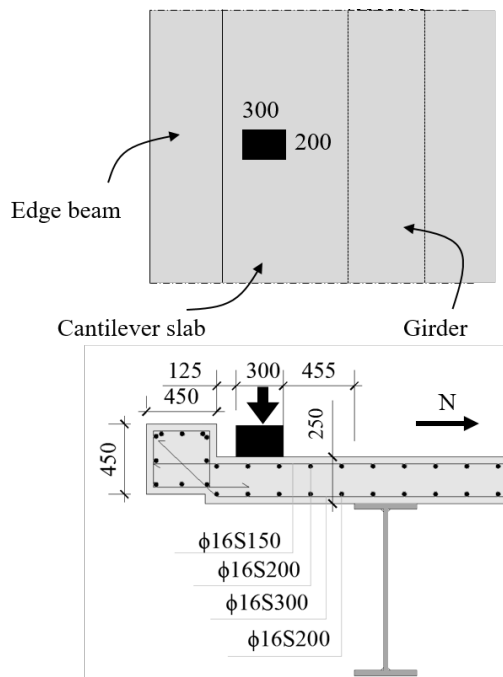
Loaded section A-A: load position, the dimension of the bridge deck slab and the layout of the reinforcement bars. All dimensions are in mm. From Shu *et al.* (2019).
